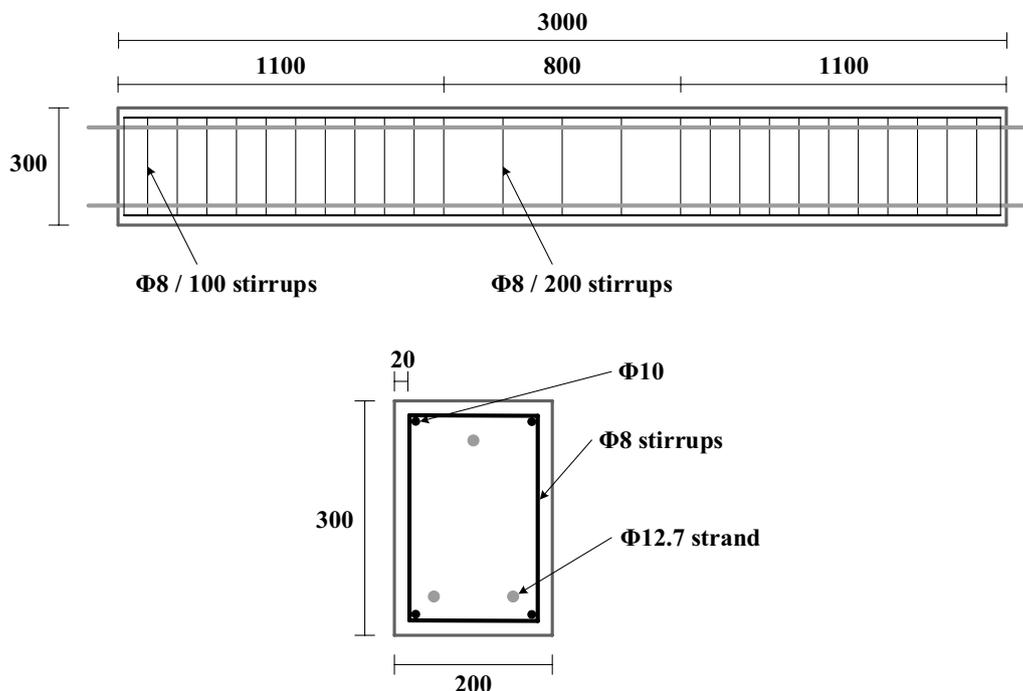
Beam geometry (dimensions in mm) (Rinaldi et al., 2010)
